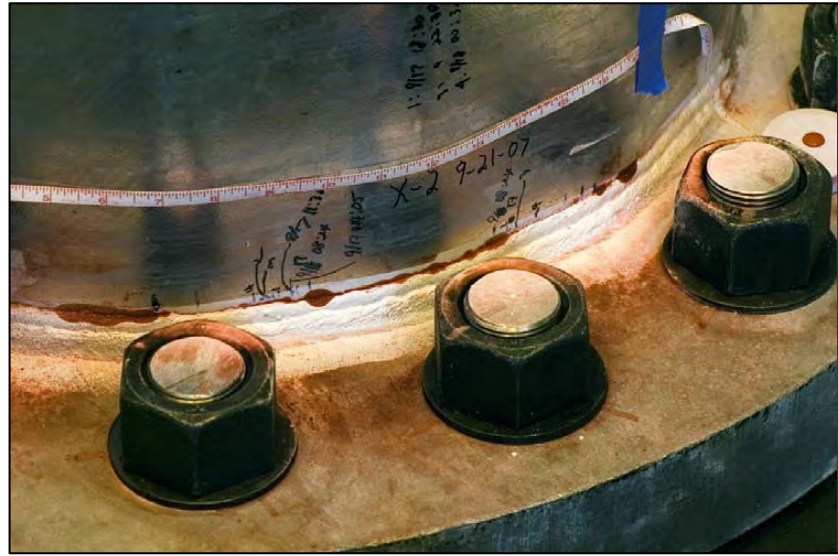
Fatigue cracking at the connection pole-base plate fillet weld toe (NCHRP-176, 2011)
